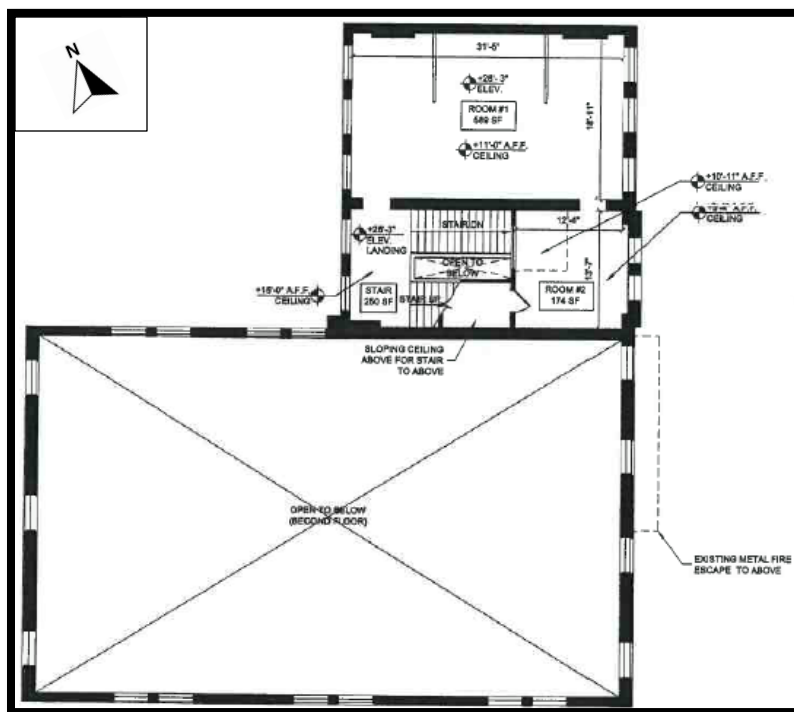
635 6<sup>th</sup> Avenue, City Hall, Third Floor
